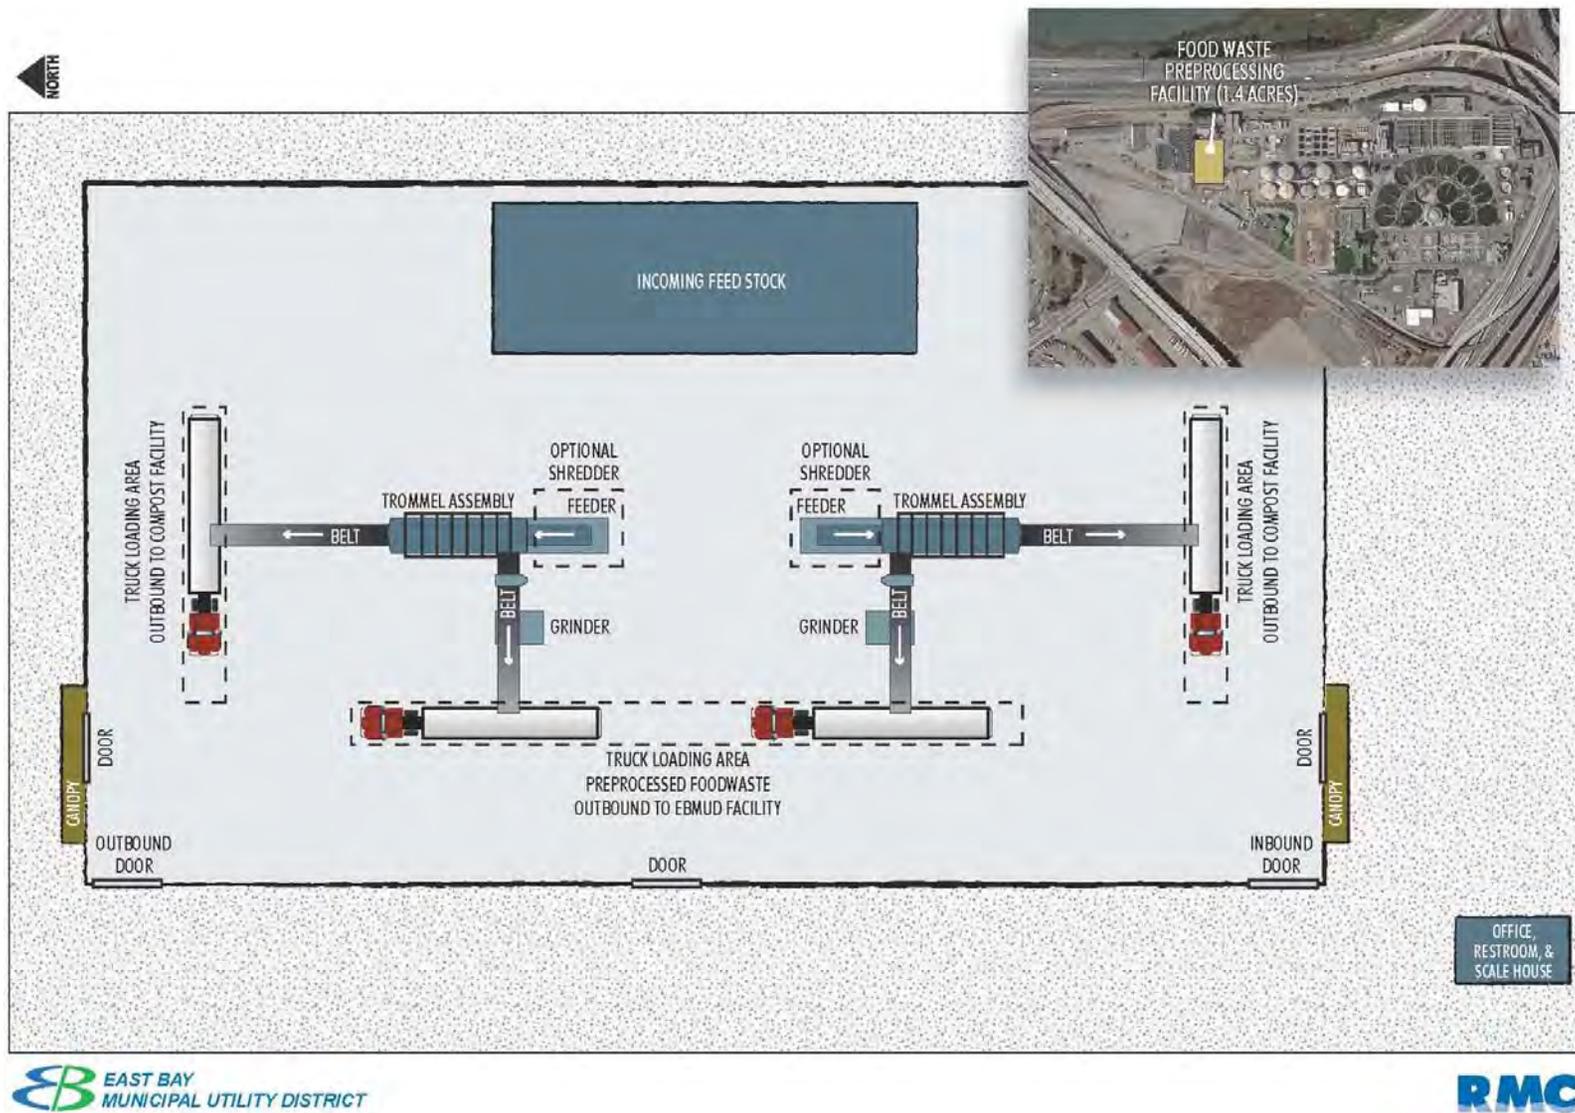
Food Waste Preprocessing Facility Preliminary Site Plan
